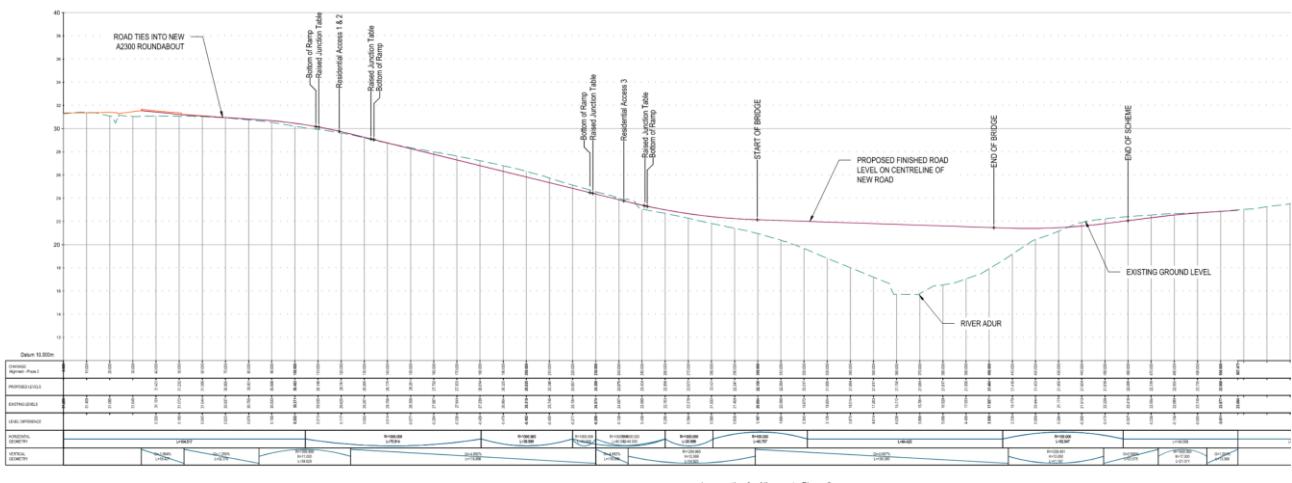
extract from drawing 0224 showing the existing ground and proposed levels along centreline of the road
